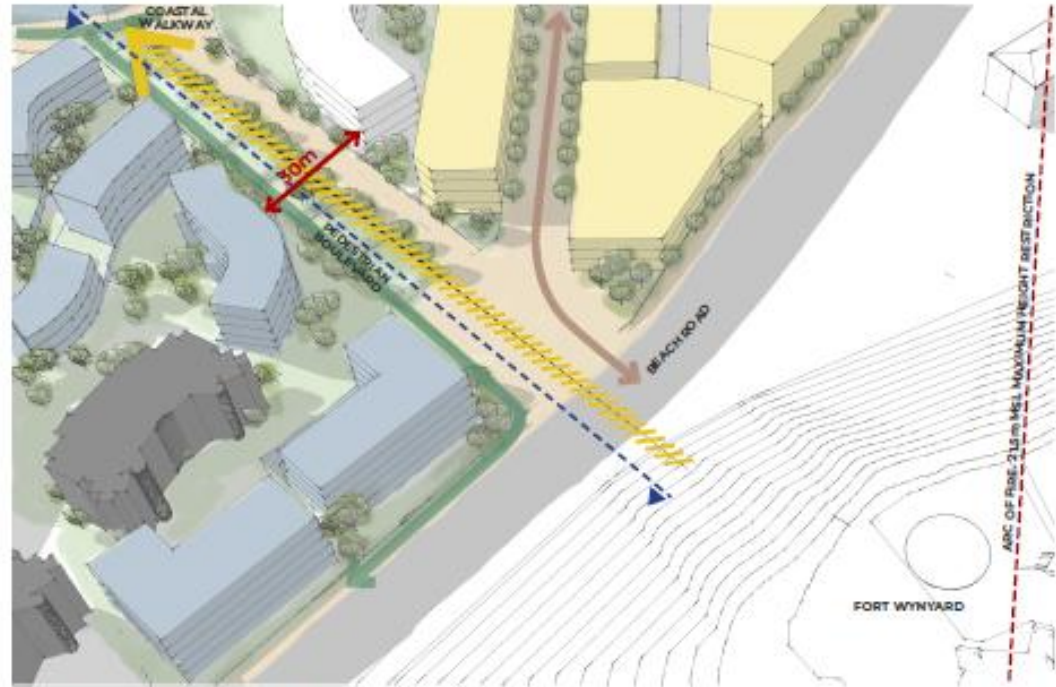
VIEW 1, PACKAGE 1, 2 & 6 APPLICATION OF DESIGN CONSTRAINTS
